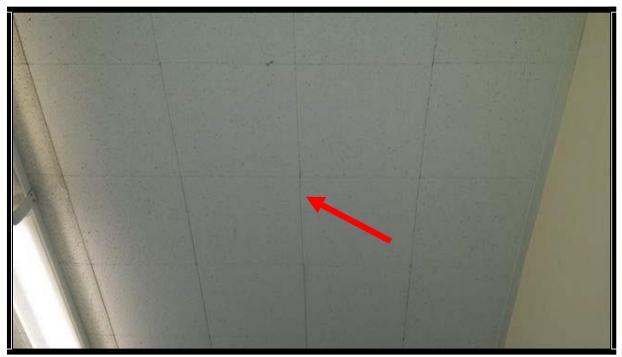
1'x1' Fissured Ceiling Tile, White
